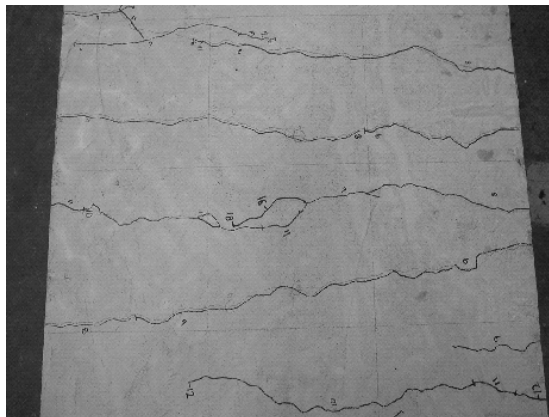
Typical Crack Pattern (Specimen B-9)
